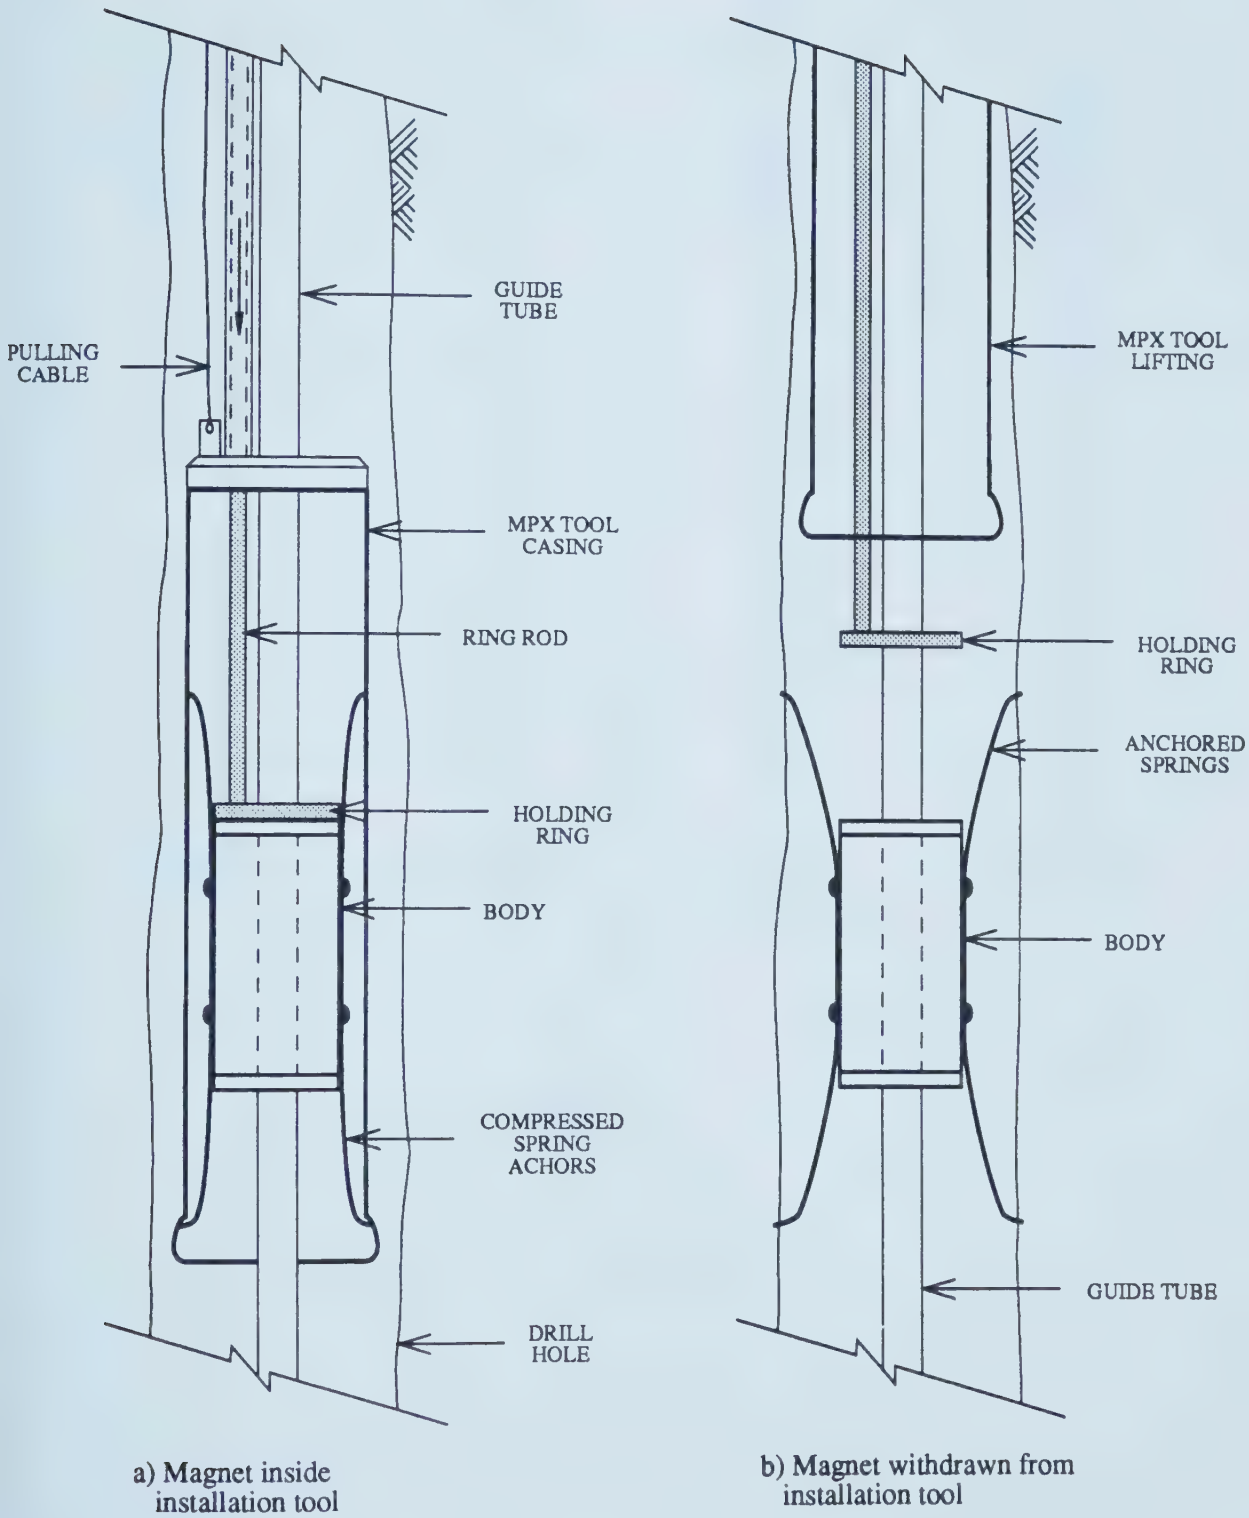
Installation Details of Anchor Assembly for Multipoint Extensometer
